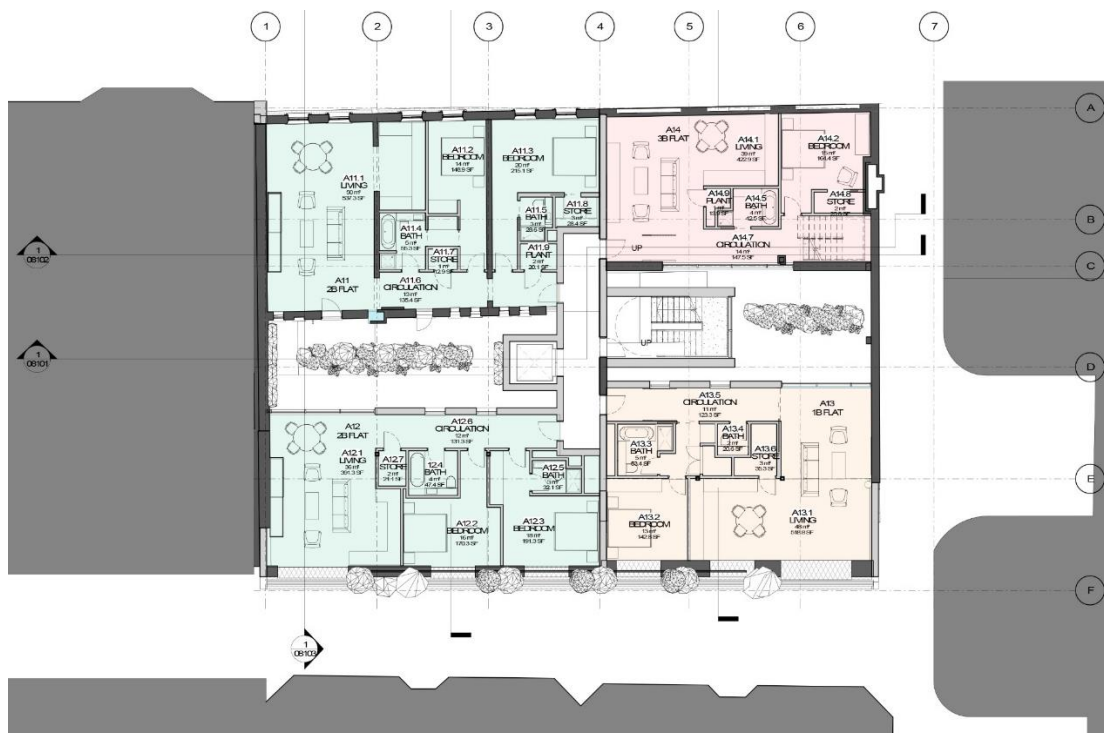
Cut & Carve Option [Max building retention + max on-site material reclaim/re-use] – Typical Floor Layout
